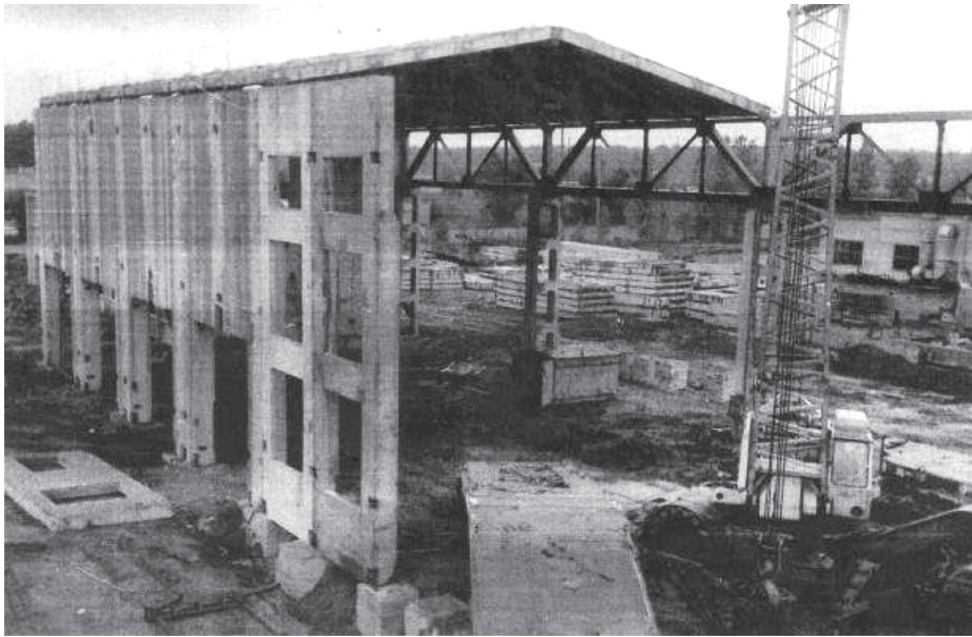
Building with the use of prefabricated reinforced concrete covering panel during installation
